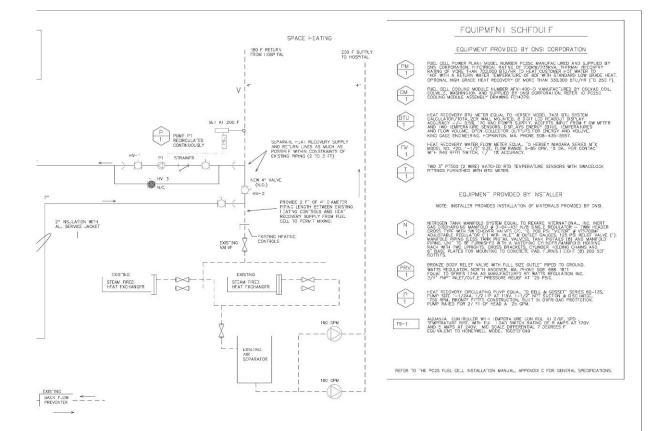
Final installation drawings – mechanical piping and instrumentation diagram.
